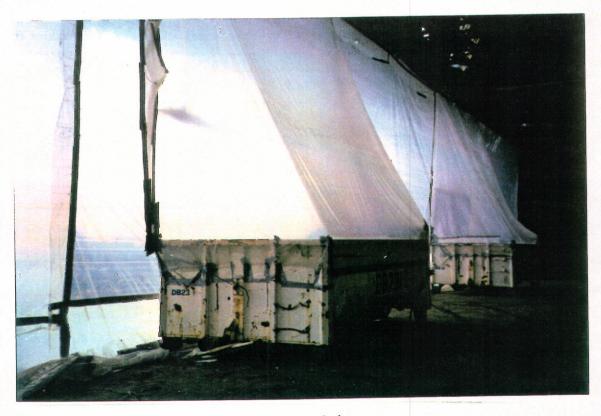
East wall of the former Rifkin building after the non-hazardous bricks were removed.
